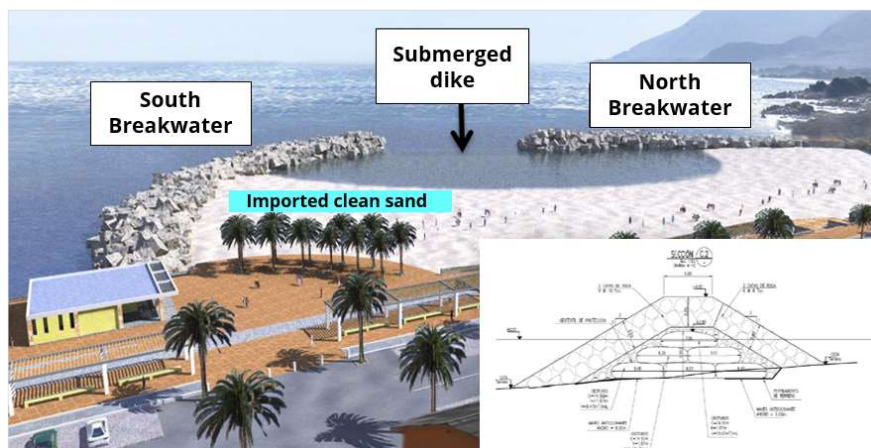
General concept of protection structures and artificial beach – Breakwater cross section
